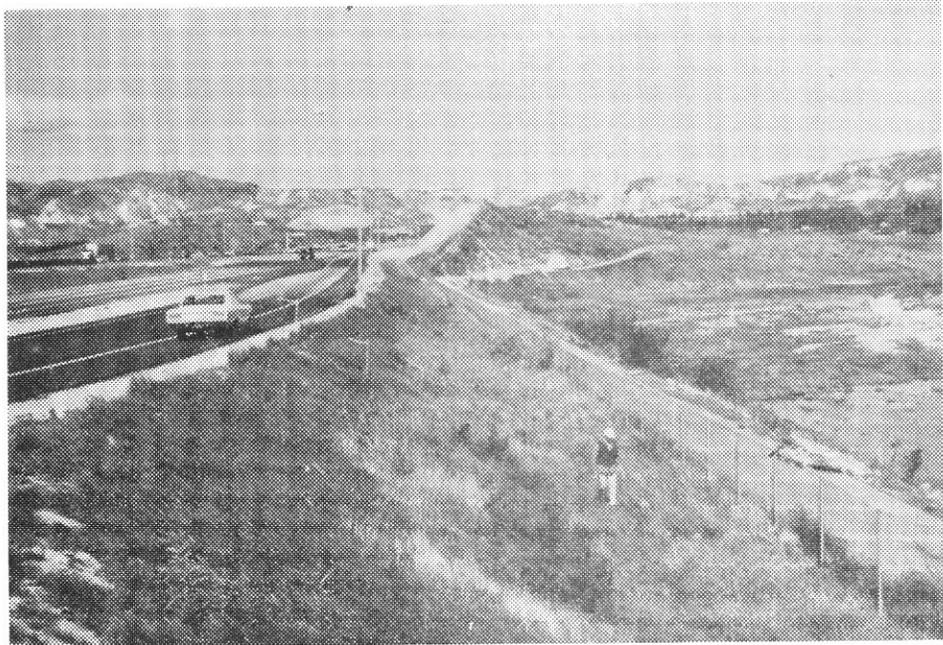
Looking northerly along easterly slope of Route 5 embankment.
